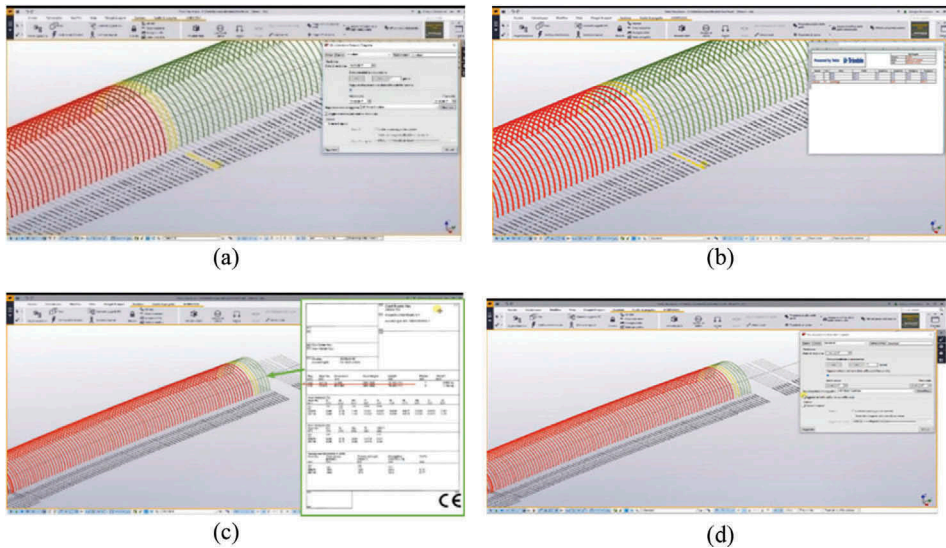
(a) 4D Tunnel model – Progress report. (b) 4D Tunnel model – Construction accounting support. (c) 4D Tunnel – Certification report. (d) 4D Tunnel model – Stock Report.
